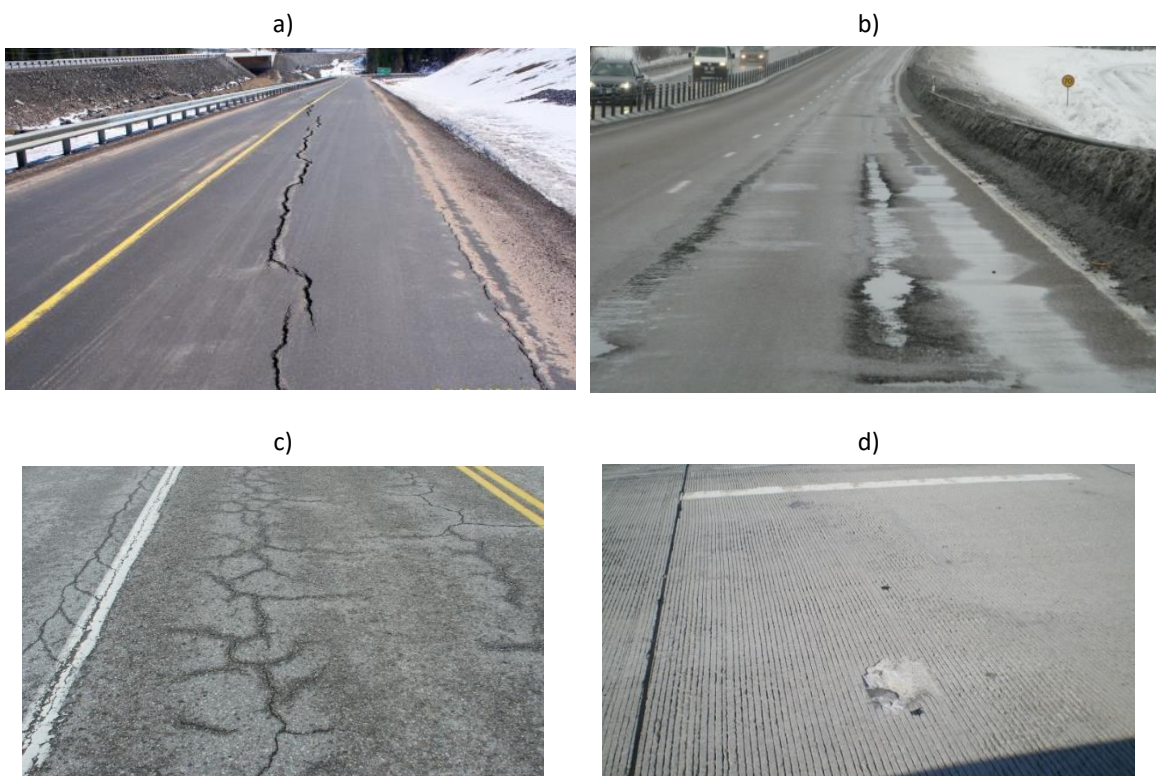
Common pavement damage related to freeze/thaw process; a) an impact of frost heaving; b) ravelling and potholing; c) fatigue cracking; d) concrete slab scaling; ©Hein, D.
